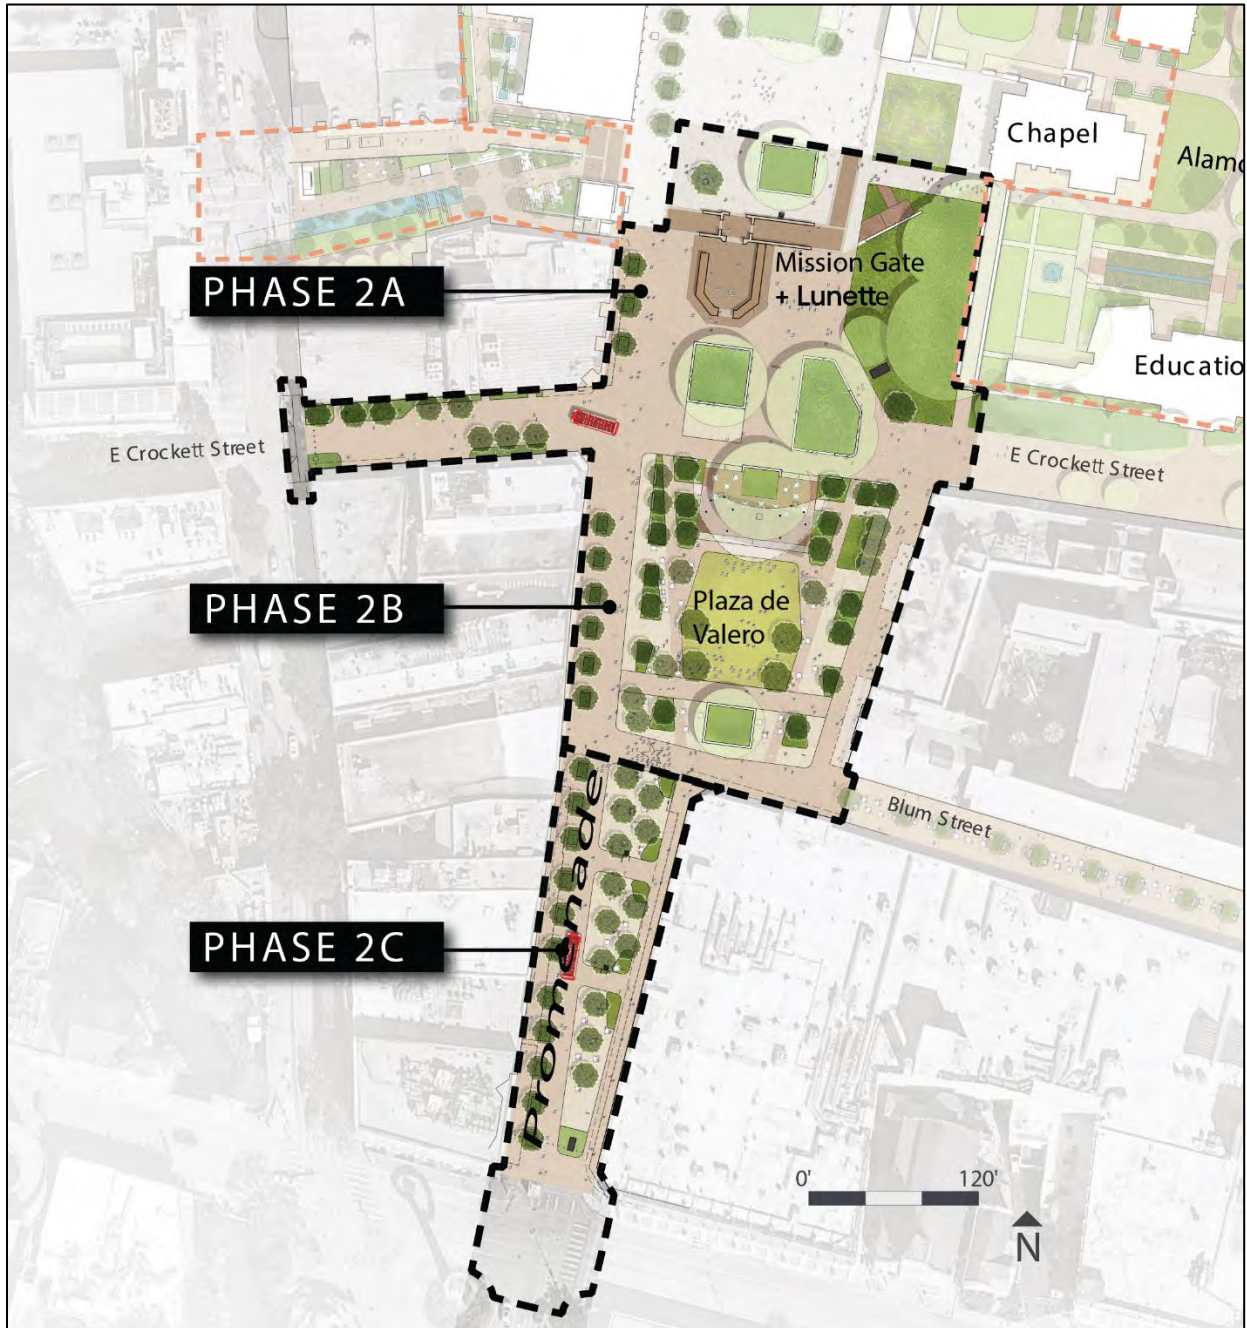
Project Area design overview of the Phase 2- Alamo Plan Project.
